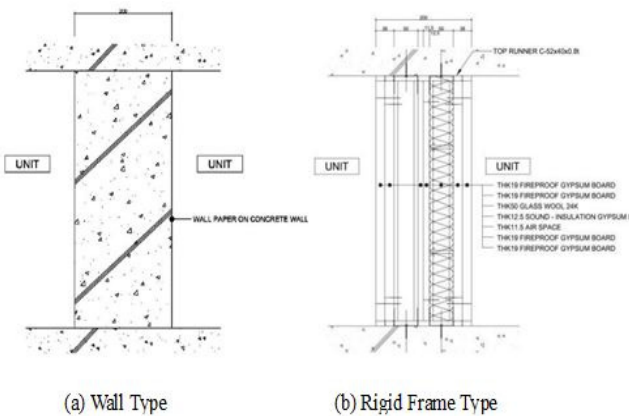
Interior Wall Details of Wall Type and Rigid Frame Type
